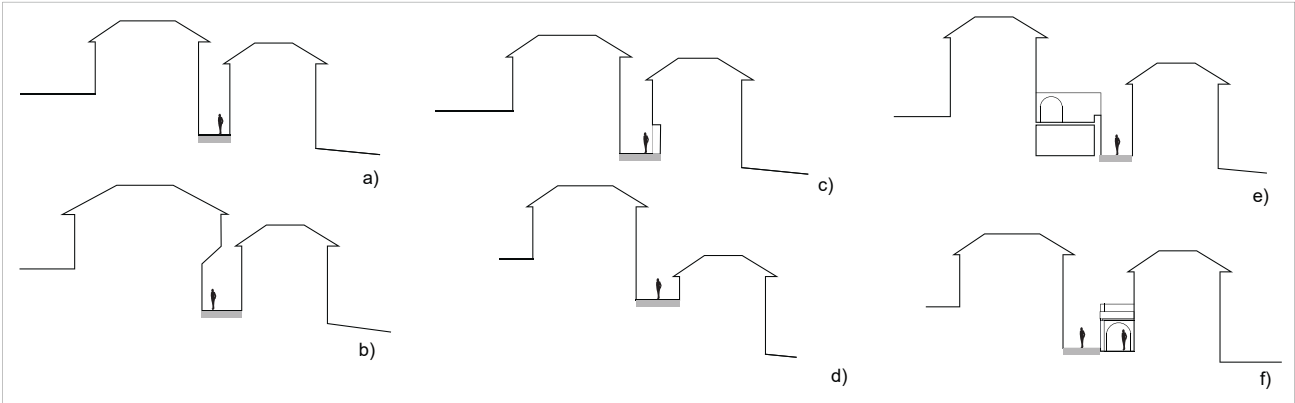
, Positive road sections in Gjirokastra: in a. Zekate house section, b. Cabej house section, c. Cene house section, d. Toro house section (source: author's)
